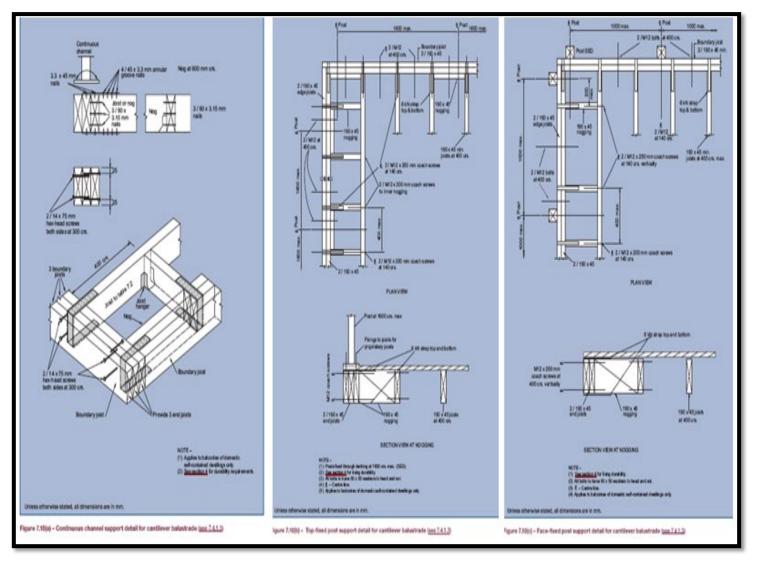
NZS3604:2011 7.10 deck balustrade connections
